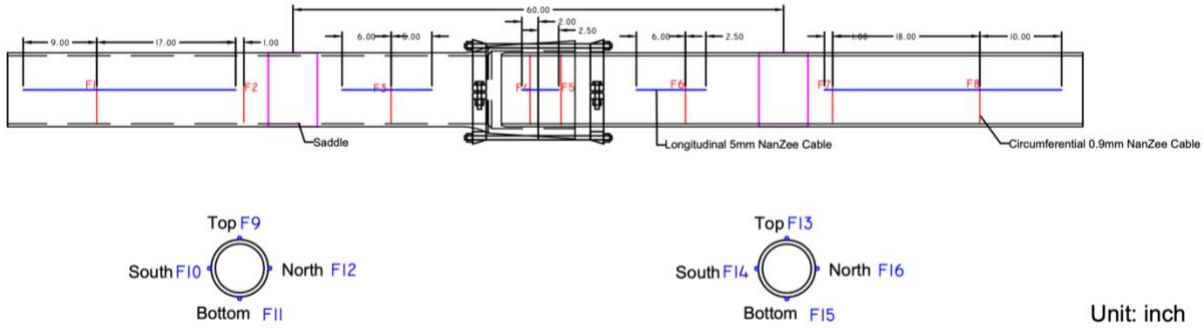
Instrumentation plan of Specimen 2 (RCT restraint)
